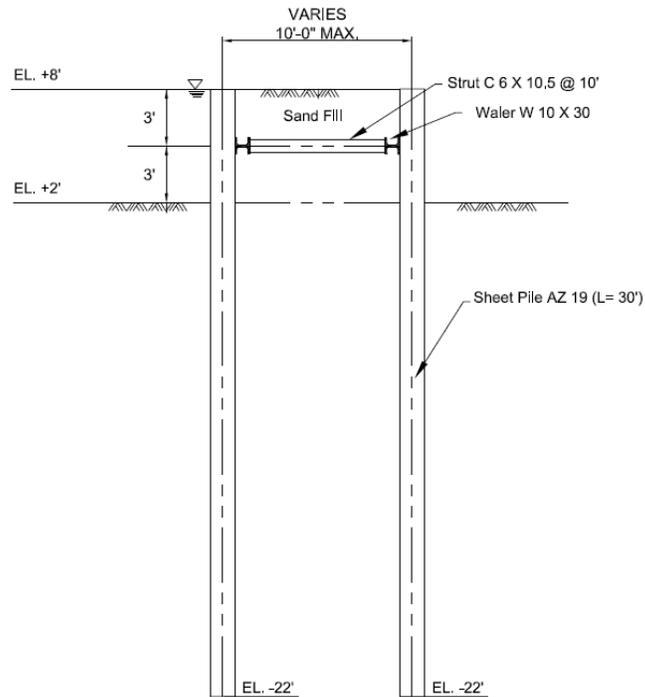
Cross-section of 6 ft Double Sheet Pile Wall for Soil Areas 4 to 7
